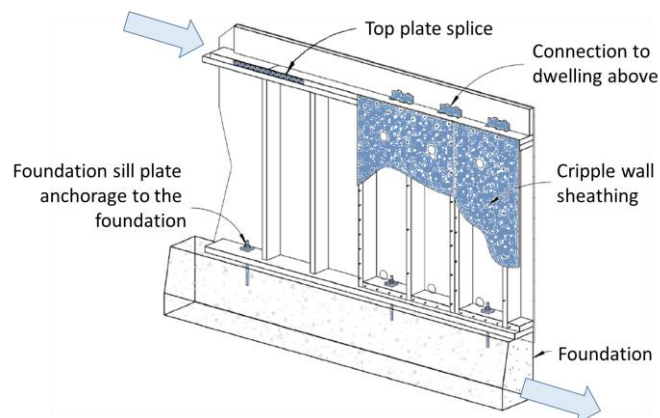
Elements of a typical cripple wall retrofit showing seismic force transfer (Image adapted from [1])
